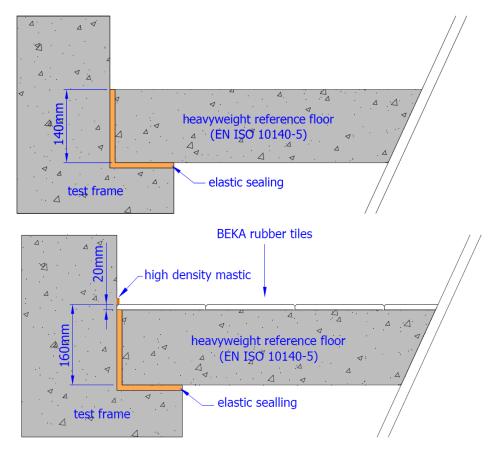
to 12 Installation and sealing of the floor covering on the reference floor
